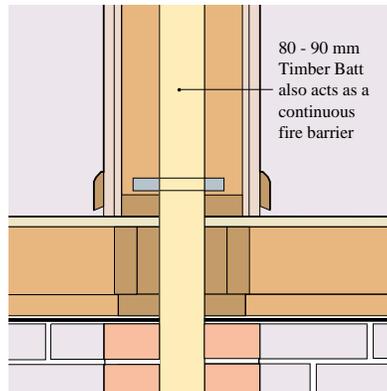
Alternative method of acoustic insulation in timber framed separating wall using Rockwool Timber Batts in the cavity
